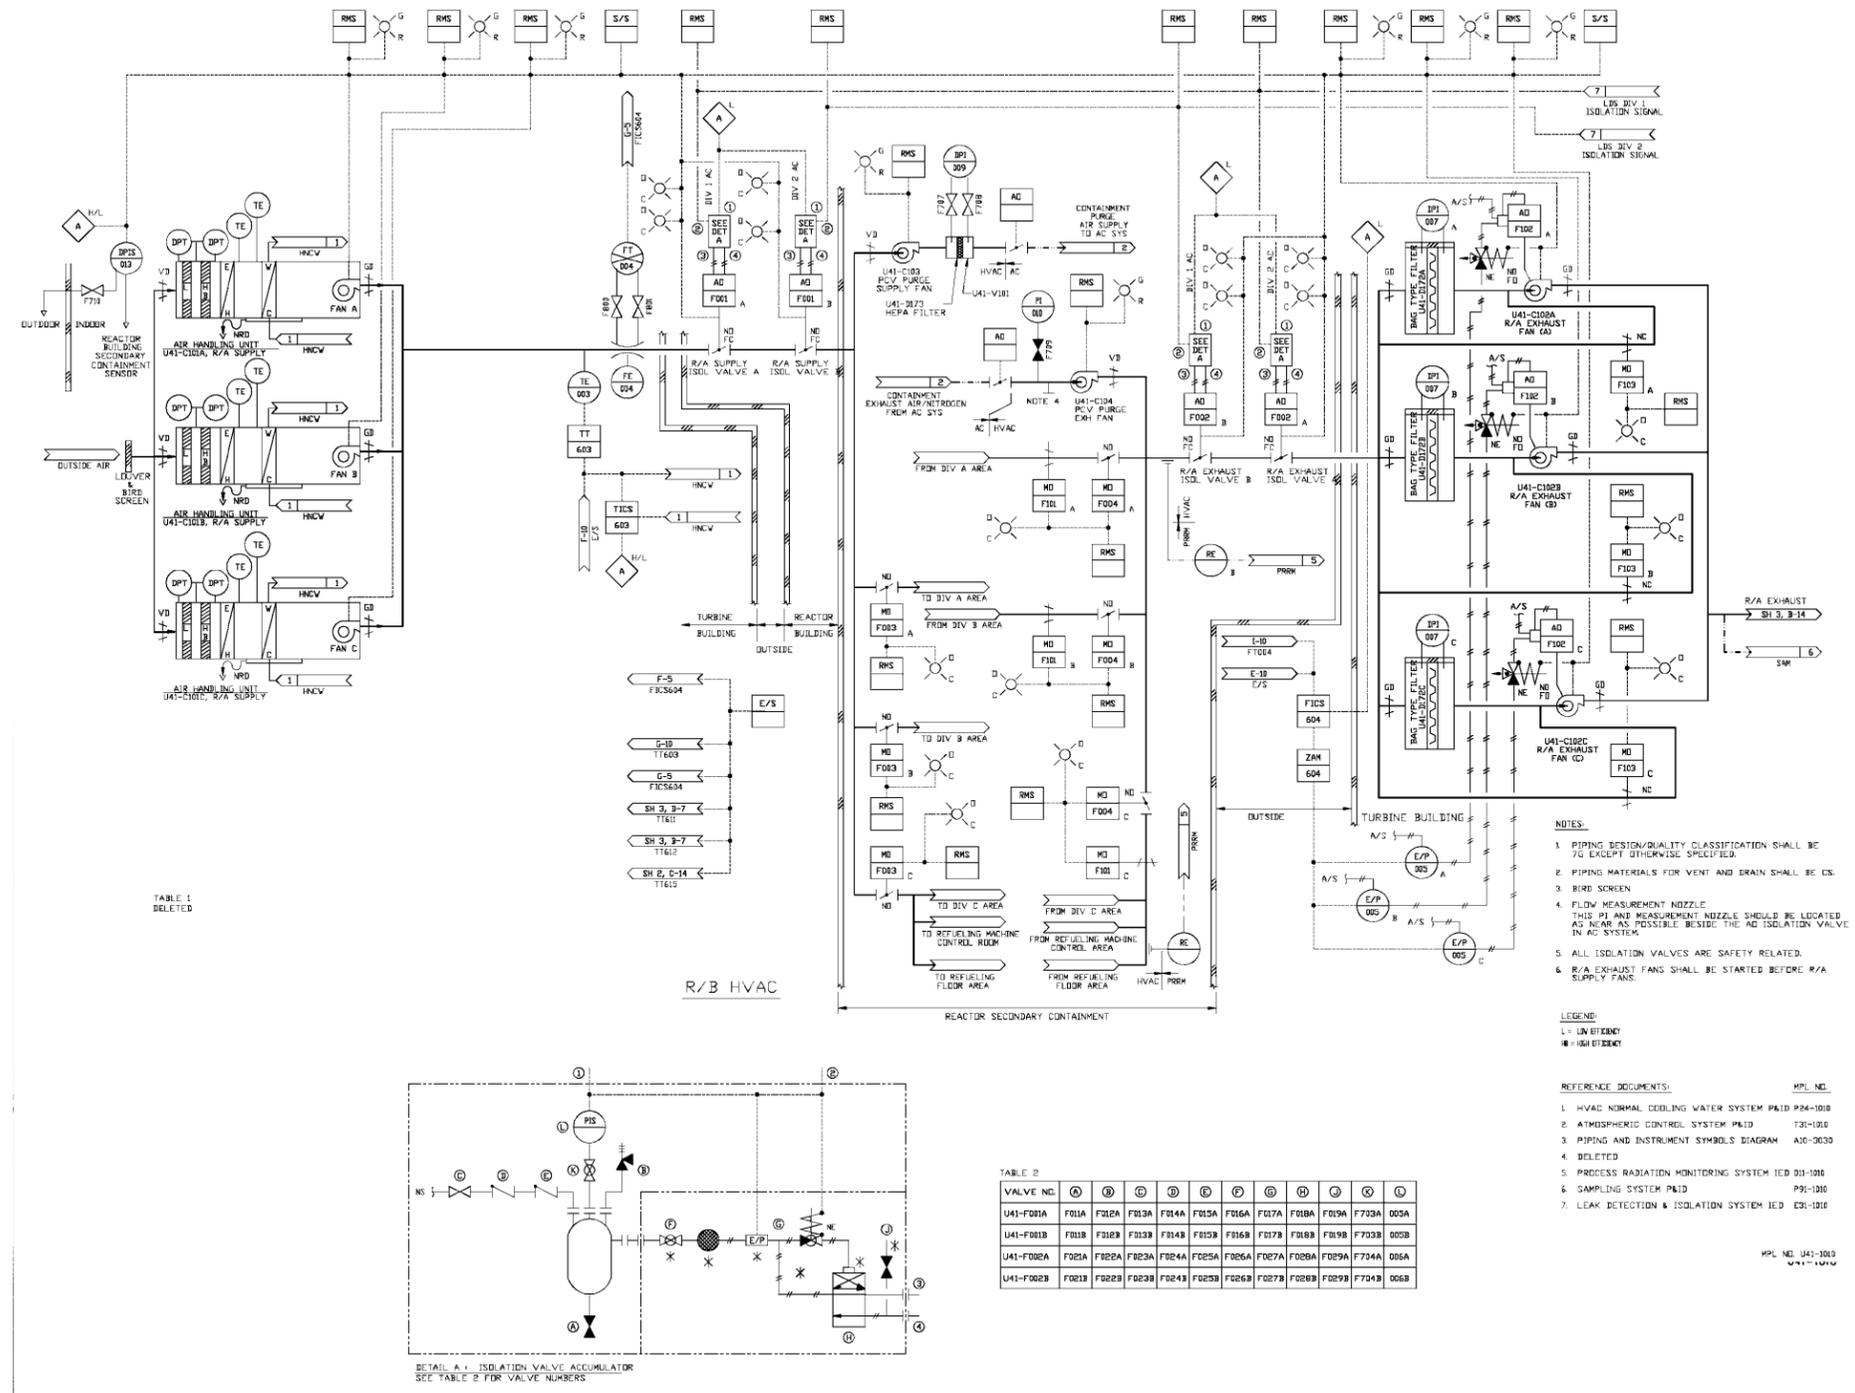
Secondary Containment HVAC System (Sheet 1 of 3)
